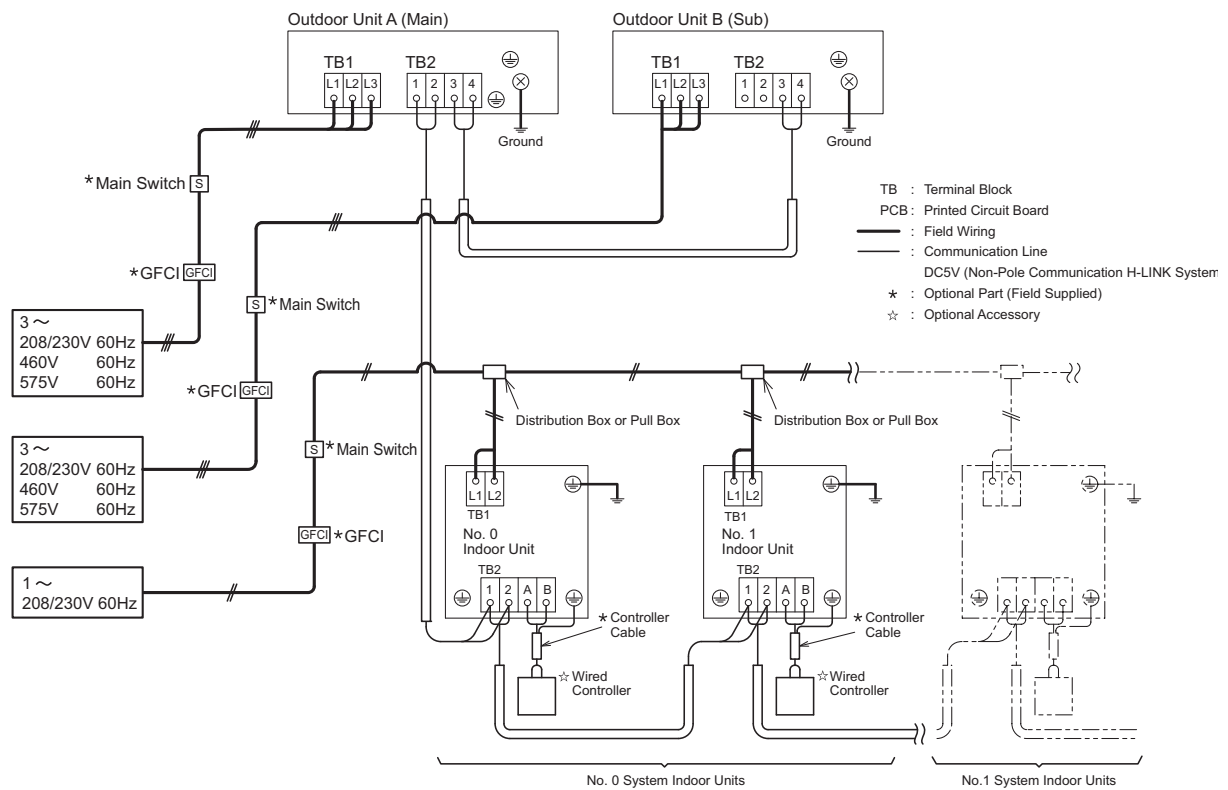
Layout for Electrical Wiring Connection (Heat Pump System)
